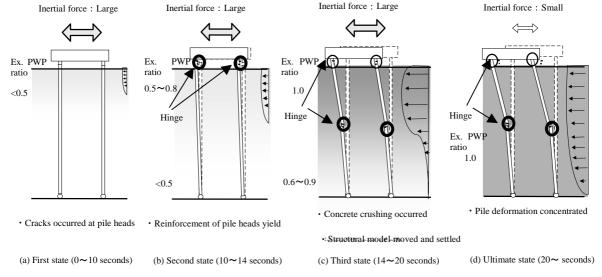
Schematic figures showing mechanisms of pile foundation damages
